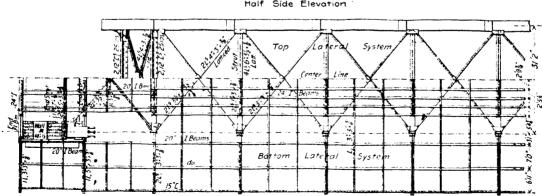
DETAILS OF TRUSS SPANS FOR VICTORIA JUBILEE BRIDGE.
